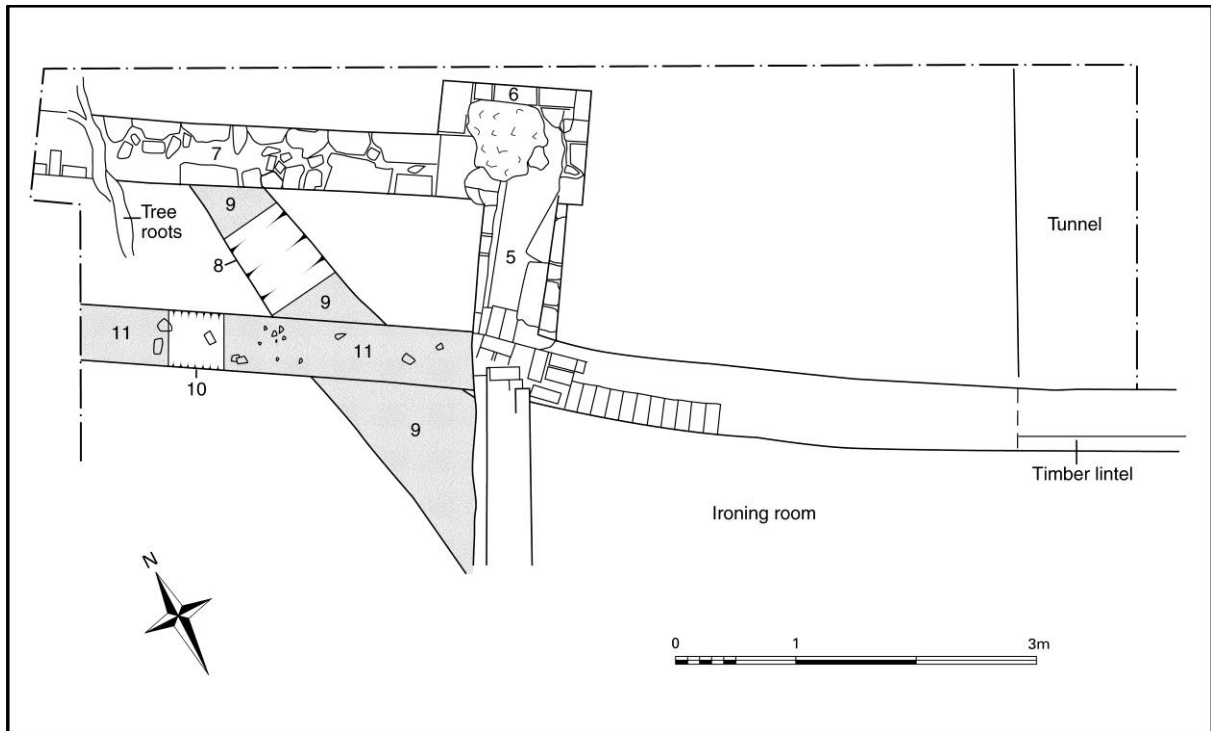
Plan of the stone walls and features truncated by the creation of the ironing room.
